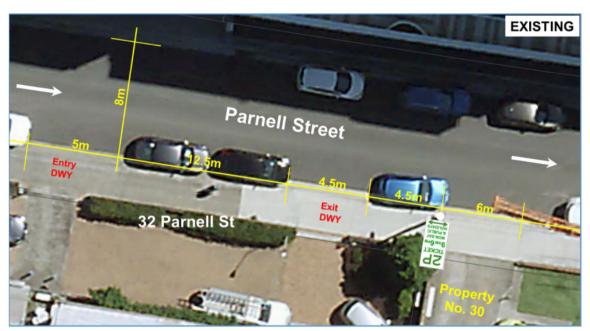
Existing parking fronting 32 Parnell Street, Strathfield.
